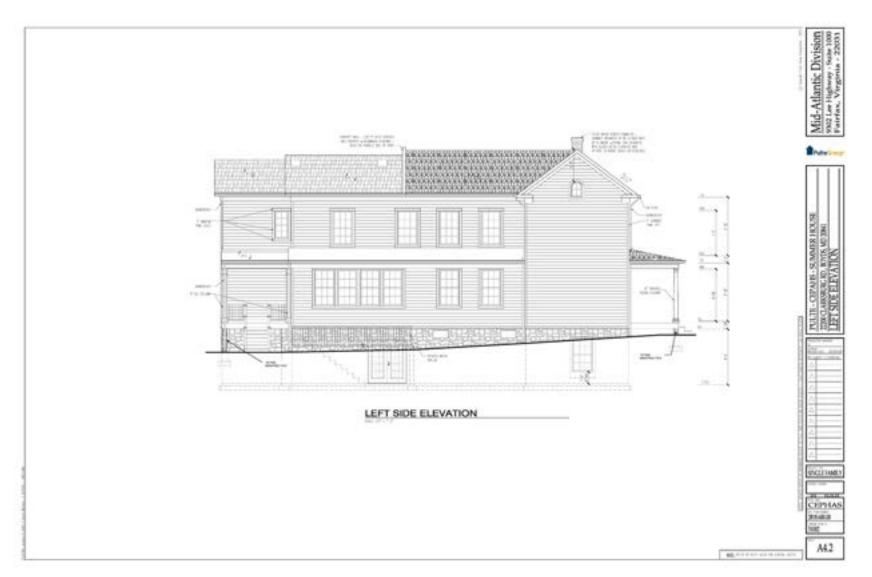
The left-side elevation provided as part of this submission. Changes include regrading and the addition of gutters and downspouts; the roof parapet wall; wrapped porch posts; basement vinyl hopper windows; and porch railing.
